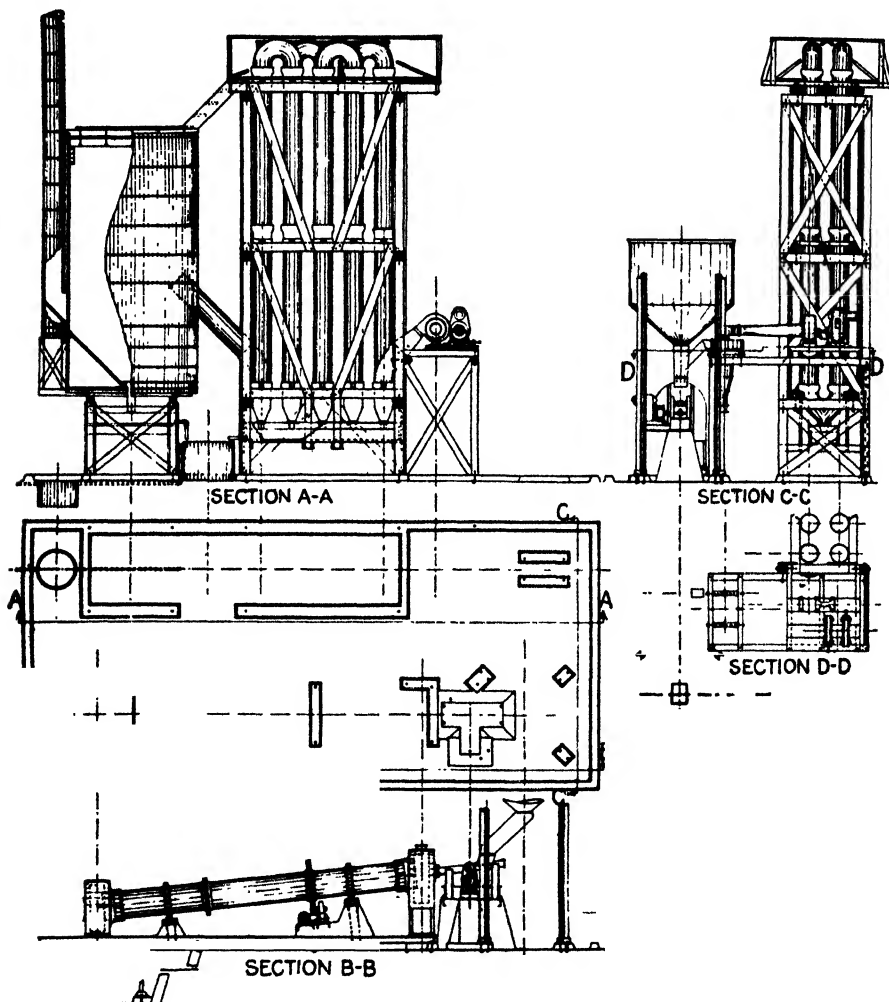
Layout of 12- to 25-ton rotary-furnace plant.
